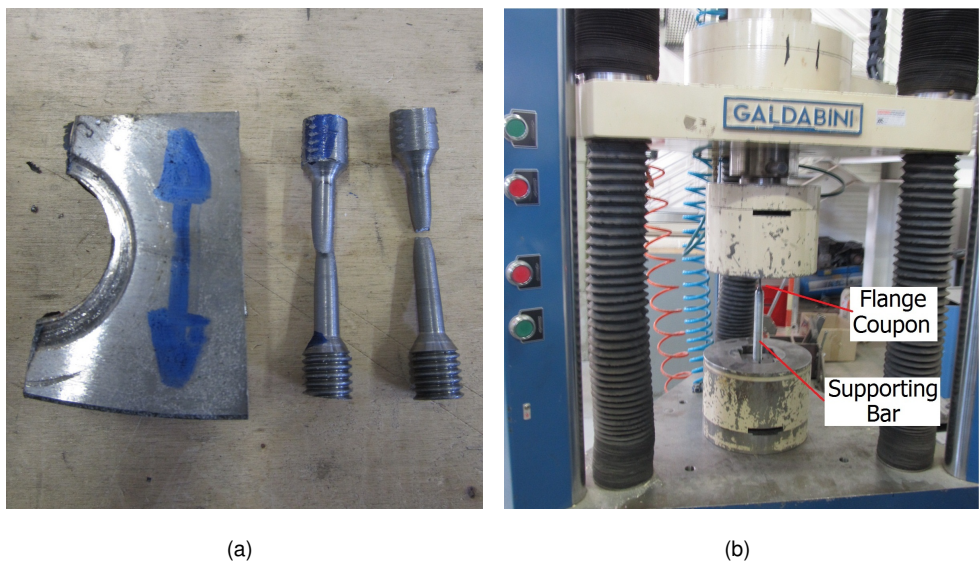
(a) Flange material coupon; (b) GALDABINI machine.
